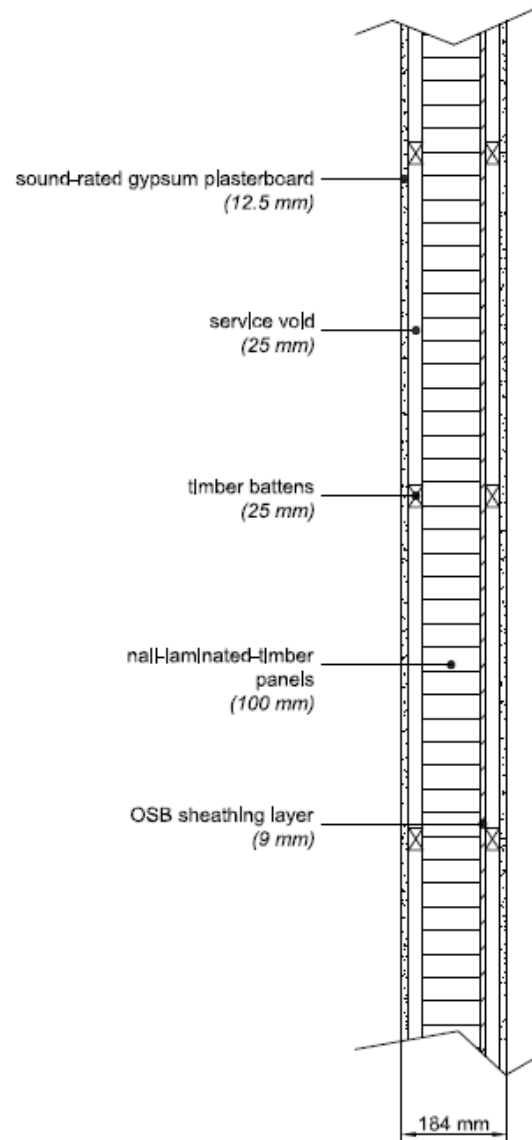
Partition wall E (nail-laminated timber), horizontal section.
